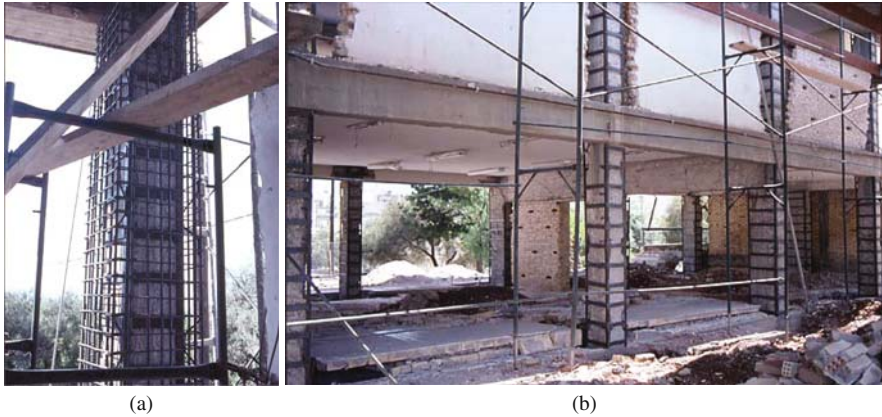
Steel jackets built-up in situ with corner angles and horizontal straps
